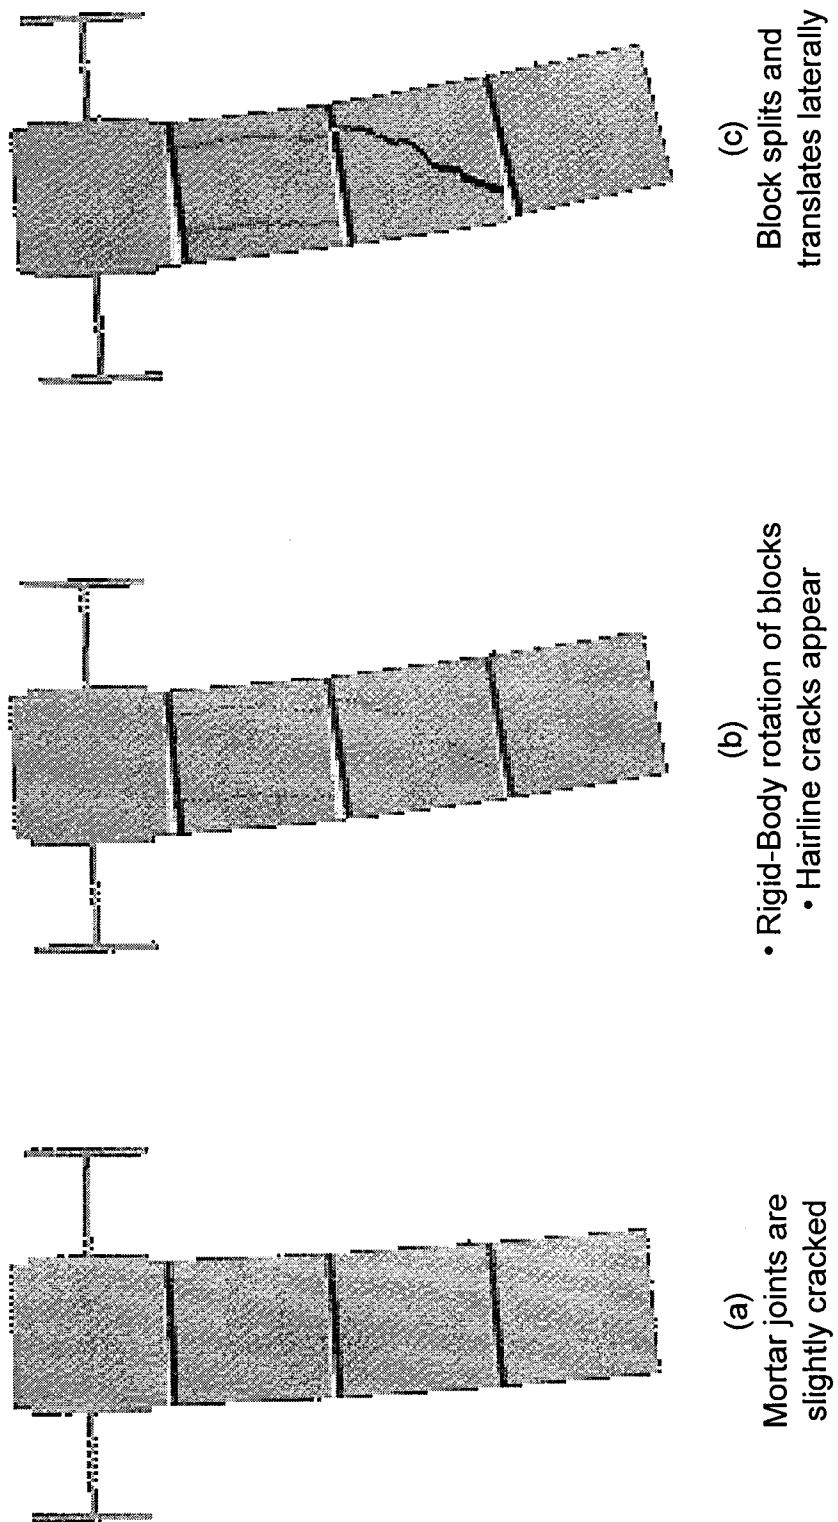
Diagonal Cracking of Masonry in Wall 4
